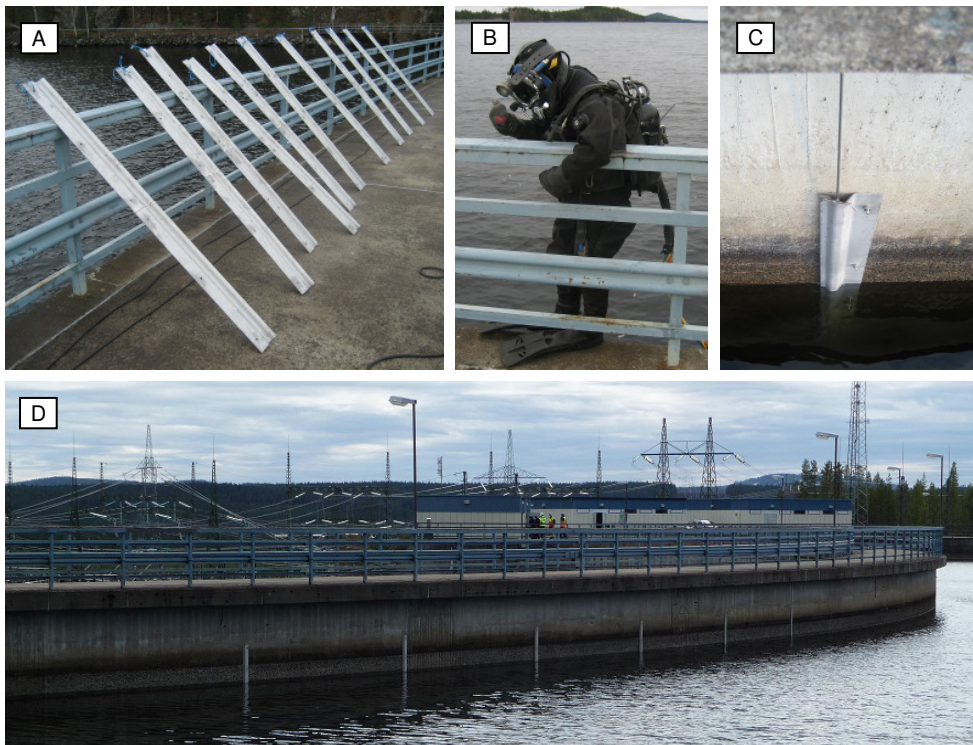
Stainless steel profiles (A) to be mounted by divers (B) on the upstream face of the arch dam (D) at Vargfors power plant. The top 0.5 m of the steel profiles are above the maximum water line (C).
